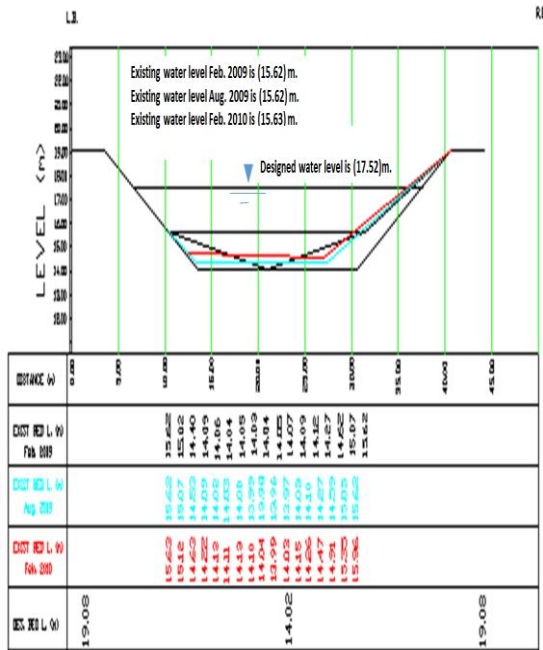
Actual and design cross sections for El-Sheikh Gaber Canal at km 83.000.
